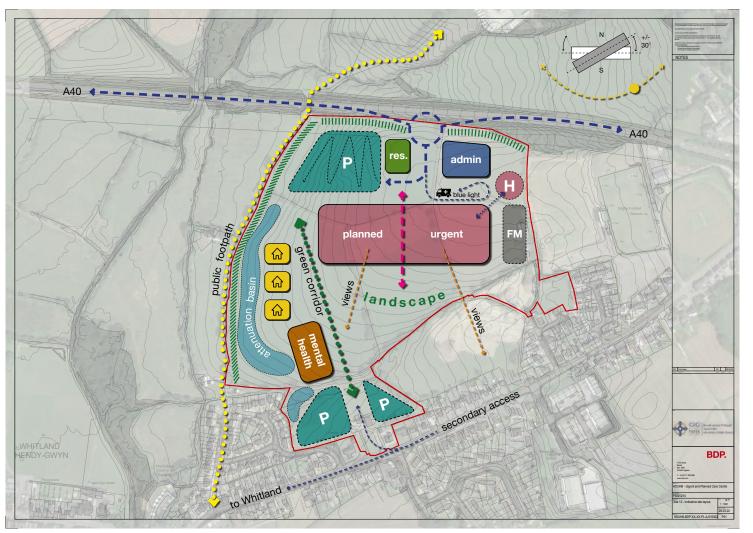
Indicative site layout showing the primary components of the proposed masterplan
